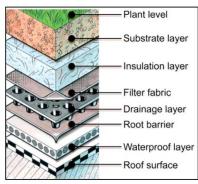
Layers of a Typical Modern Vegetated Roof (Gartner, 2008)
